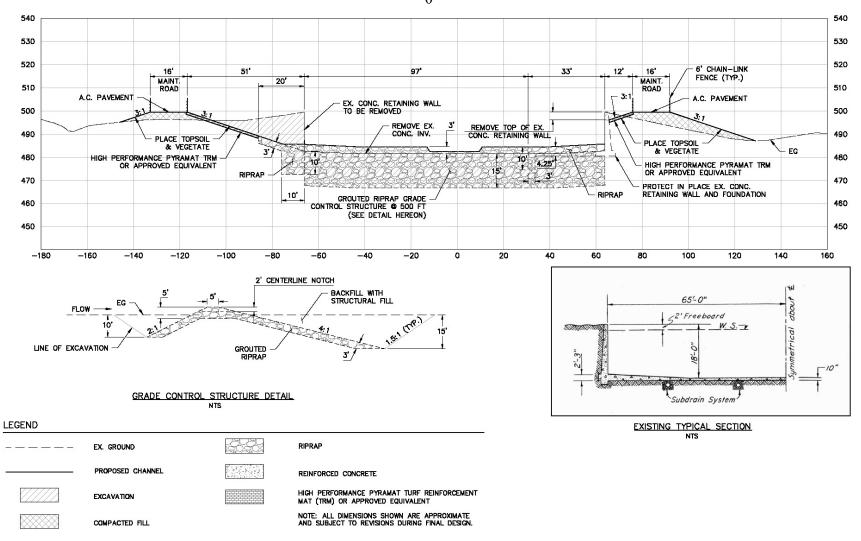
Cross-Section 1, Pollywog Park/Headworks to Midpoint of Betty Davis Park
